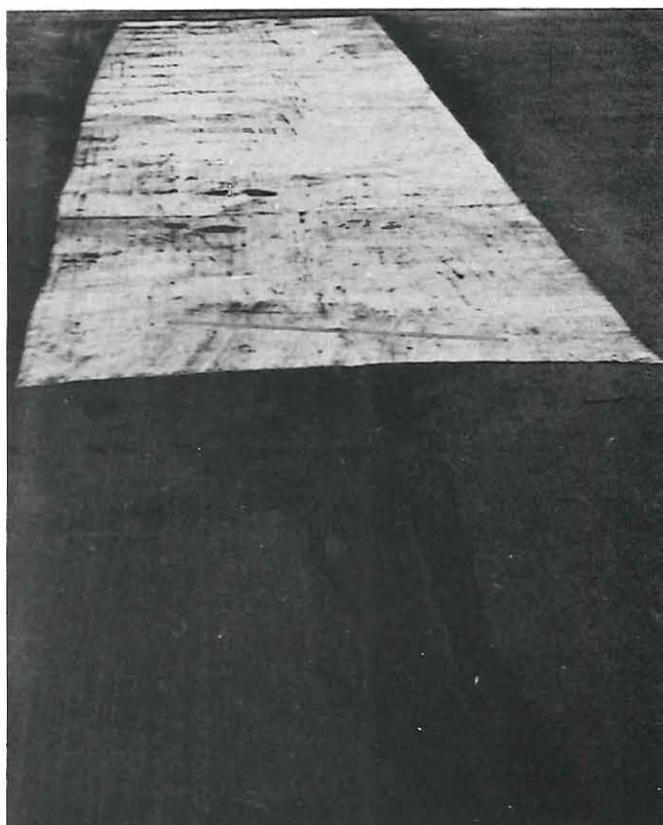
Transverse joint in concrete pavement filled with bitumen emulsion and sand and covered with polypropylene fabric prior to placing 75 mm of asphalt in two layers.
